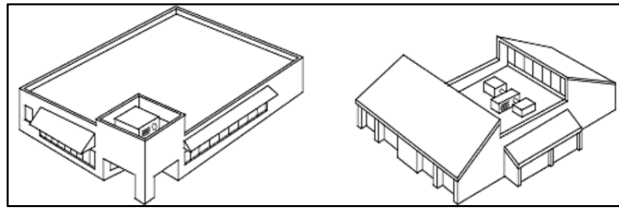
Examples of how to screen roof-mounted mechanical equipment.
